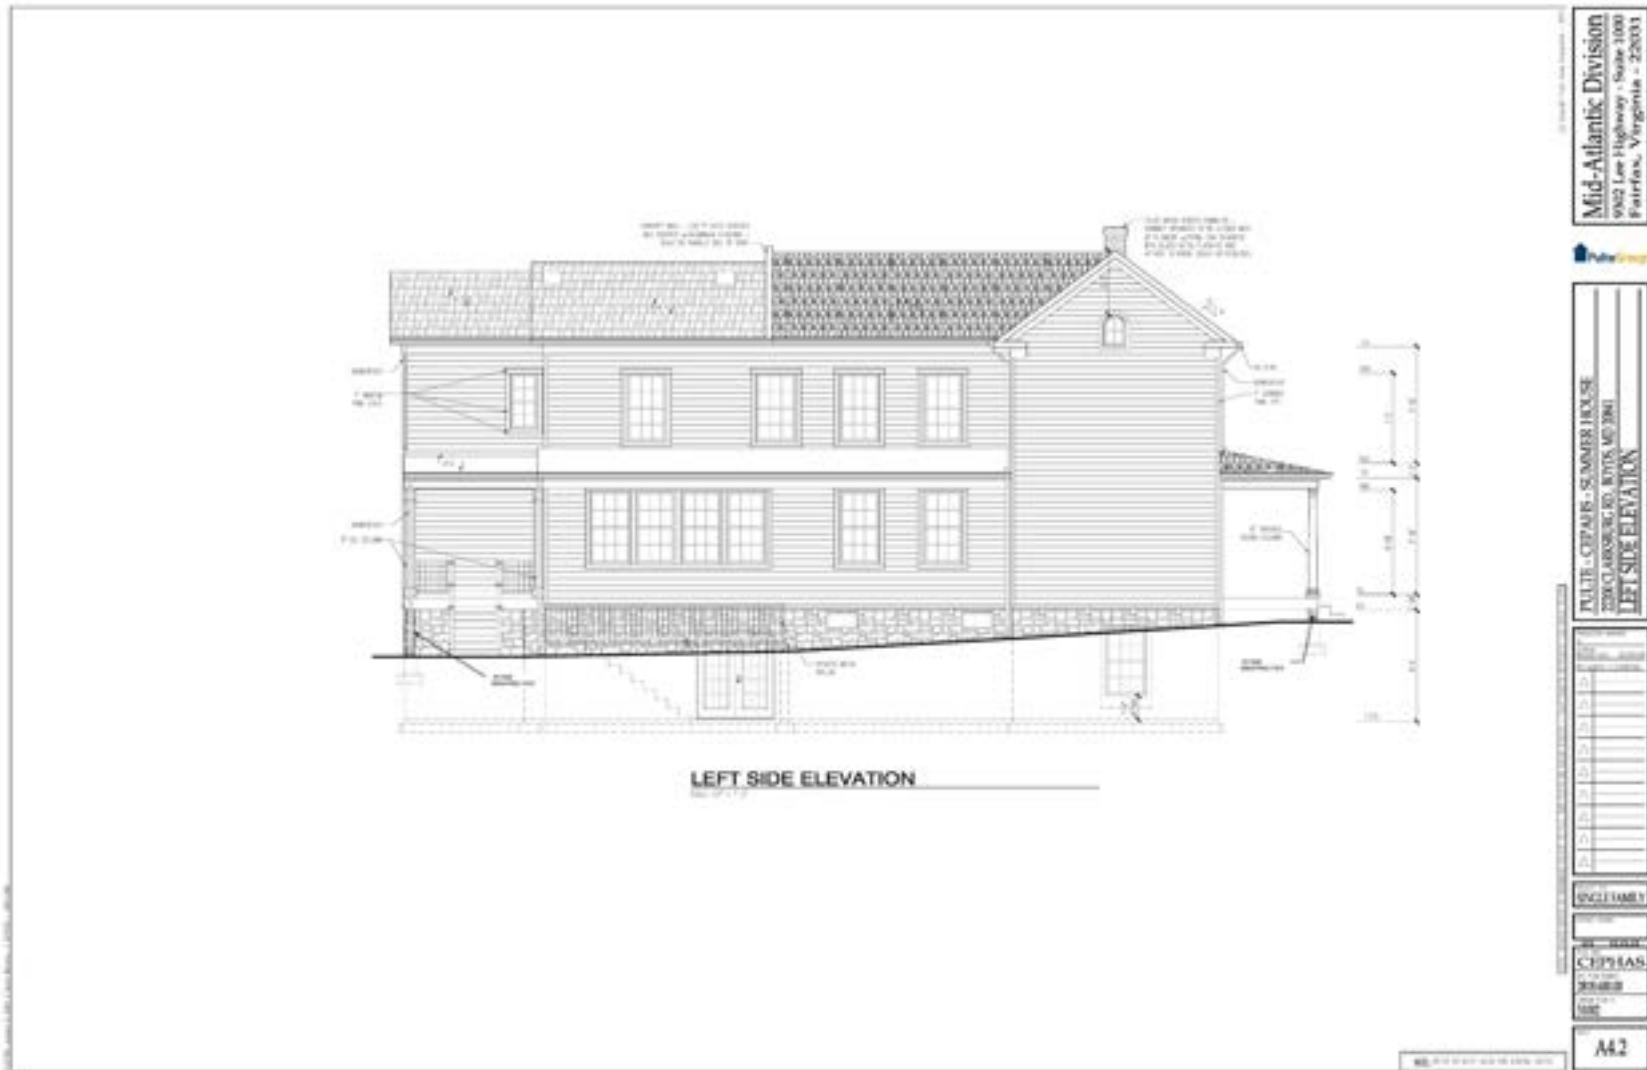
The left-side elevation provided as part of this submission. Changes include regrading and the addition of gutters and downspouts; the roof parapet wall; wrapped porch posts; basement vinyl hopper windows; and porch railing.
